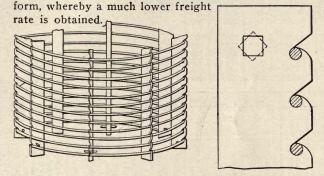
Smith Hooped Column. Fig. 30.—Connection of Hoops to Verticals, Smith Column.
